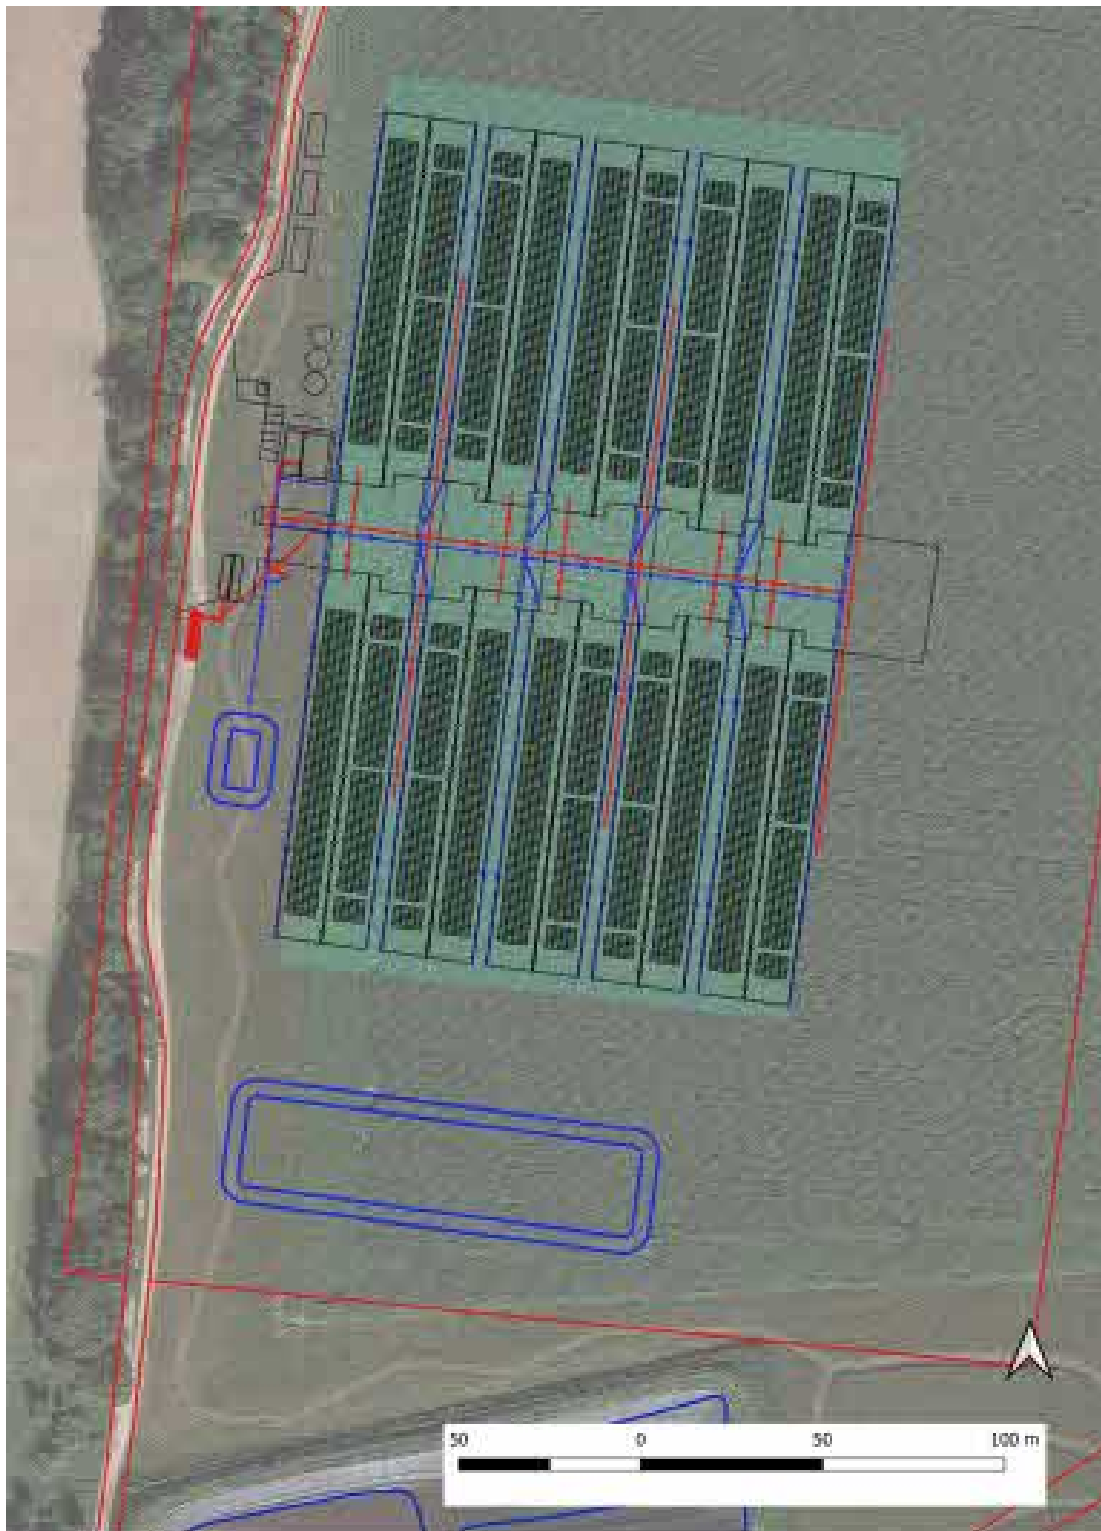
A: Existing Site Features and Proposed Drainage at Poultry Sheds
